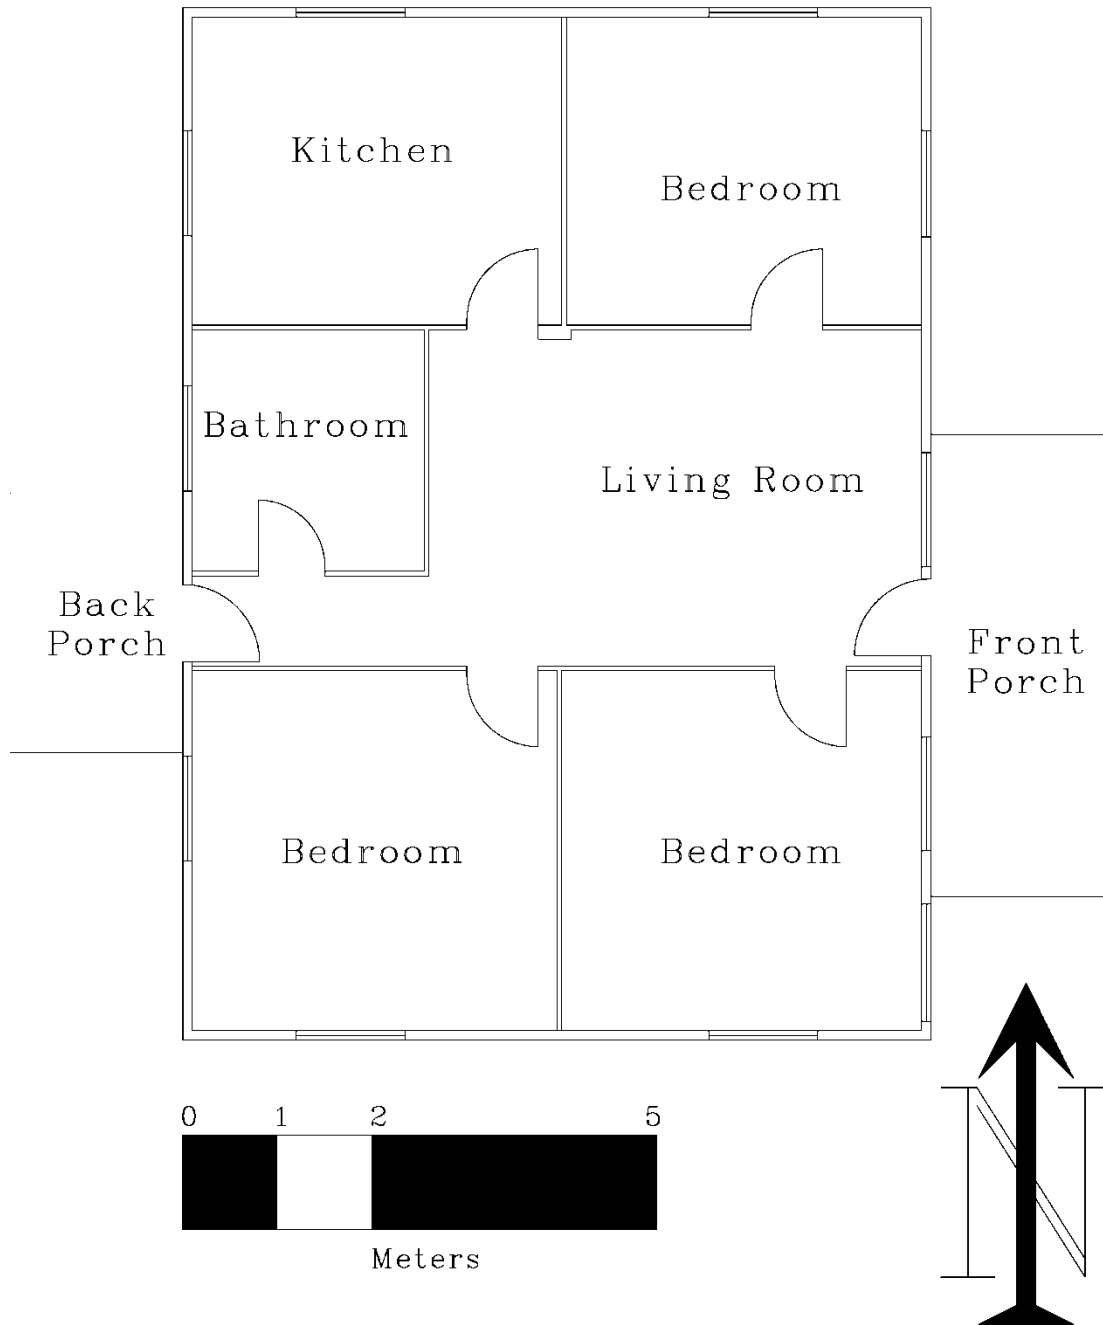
Floorplan for the Caretaker's Cottage. The base of the structure is a central-hall plan bungalow. The bathroom was not original to the house and was added at an unknown date.
